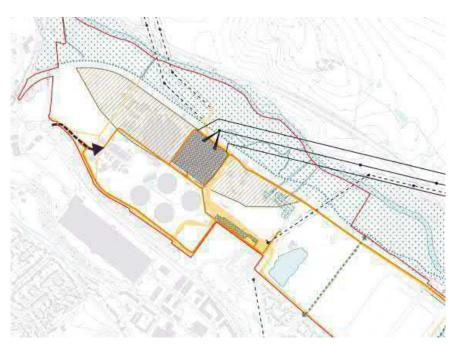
Figure 19: Design and Access Statement Extract showing retained substations within the site (Hatched Grey - 400kv centre of image, 132kv south of main image)
